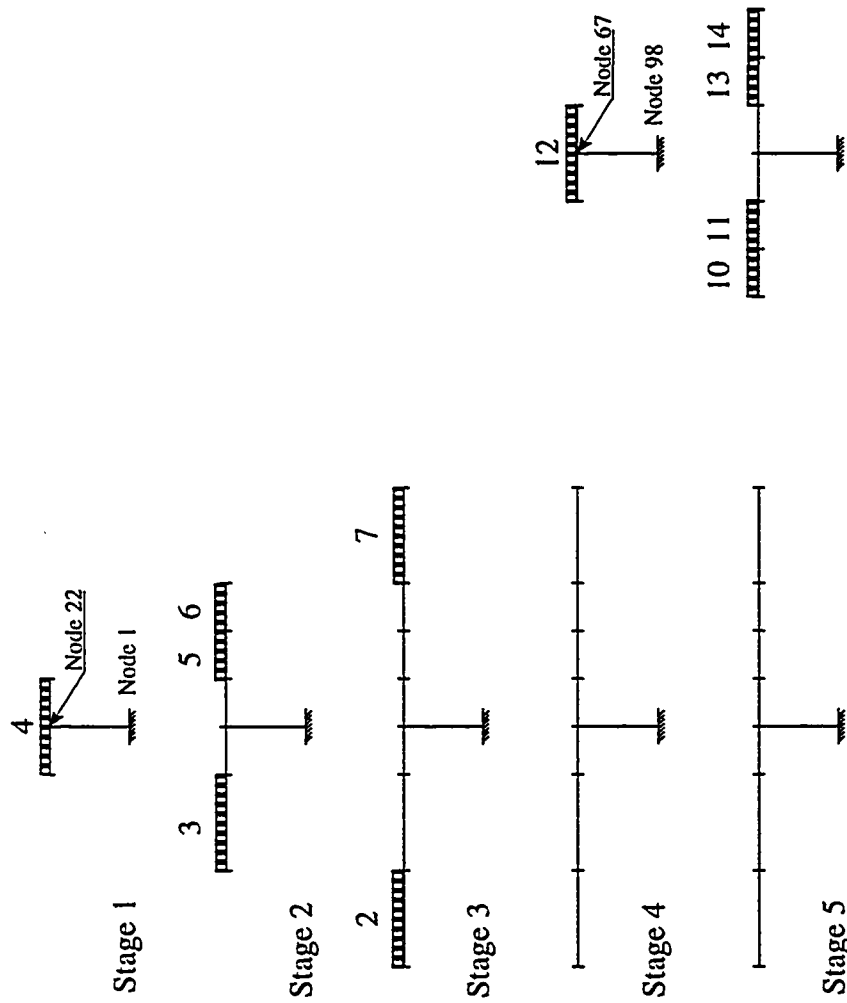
Construction Process for Bridge used in the Demonstration Example (Developed Elevation)
